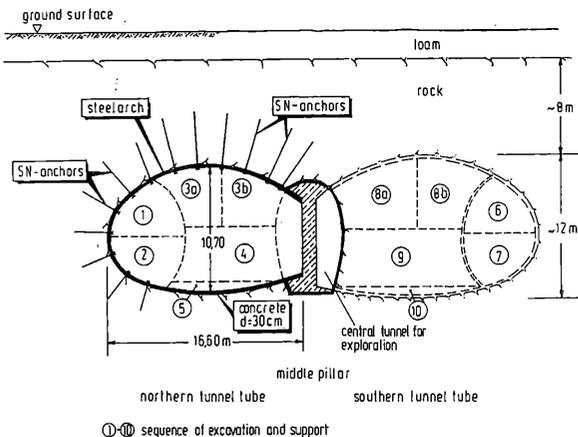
Road tunnel, Wuppertal, driving of a large cross section in partial headings, MODEMANN, WITTKÉ (1987)
